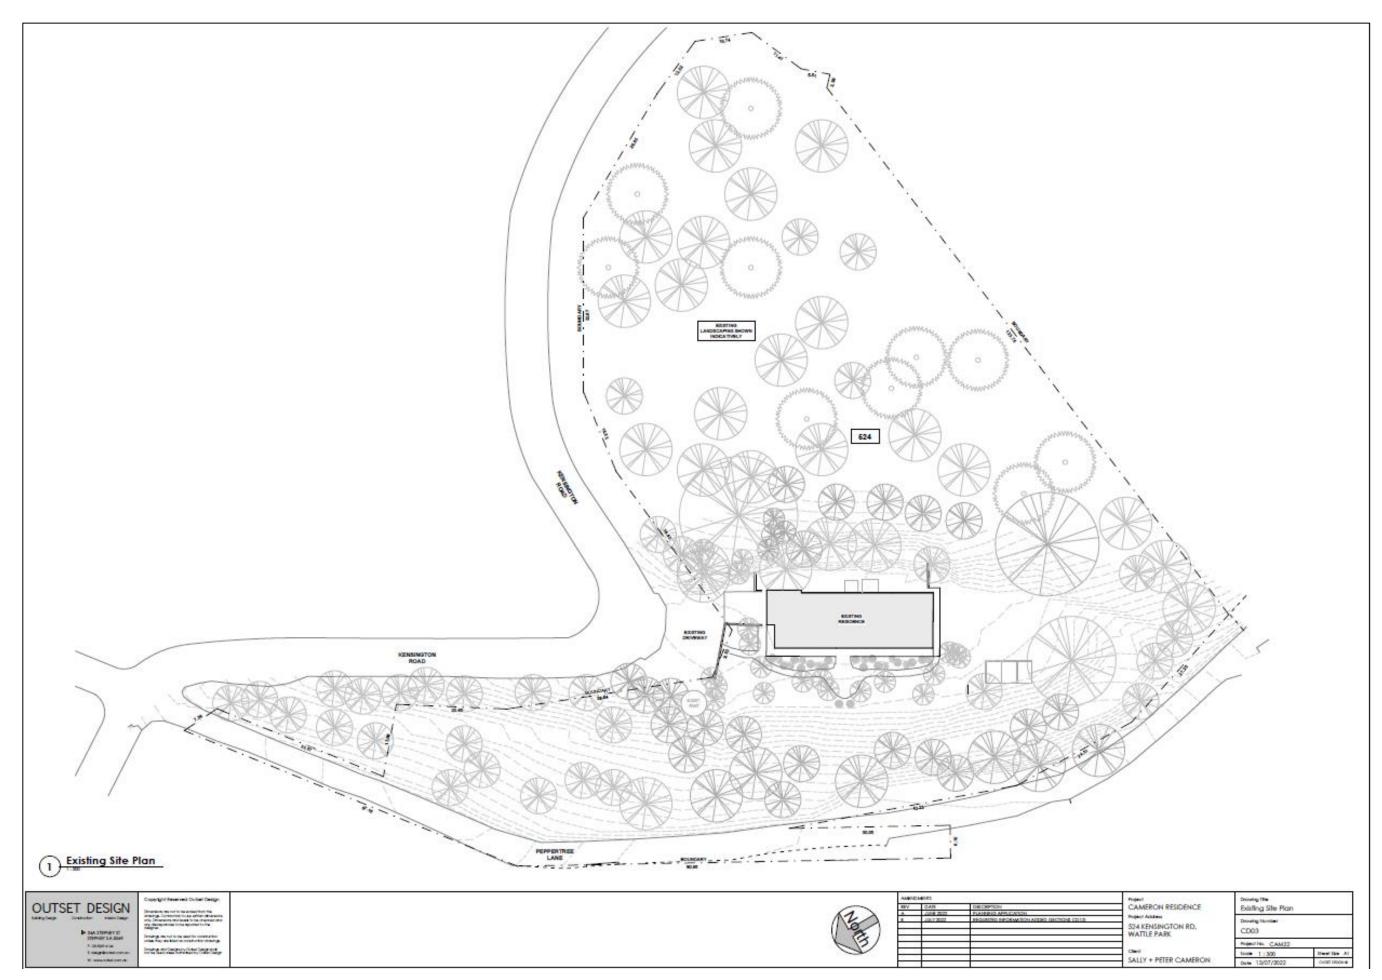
Existing site plan (provided to EBS on 28/07/2022).
